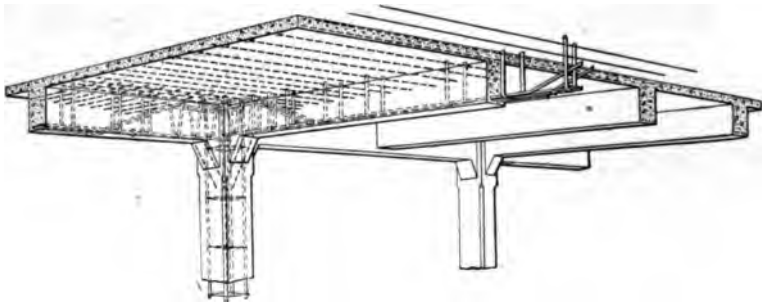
Typical Construction Unit Concrete Steel Co.'s System.
